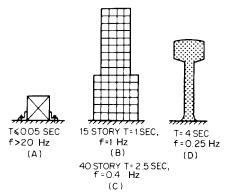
Structures subjected to earthquake ground motion. (A) A machine anchored to a foundation. (B) A 15-story building. (C) A 40-story building. (D) An elevated water tank.
